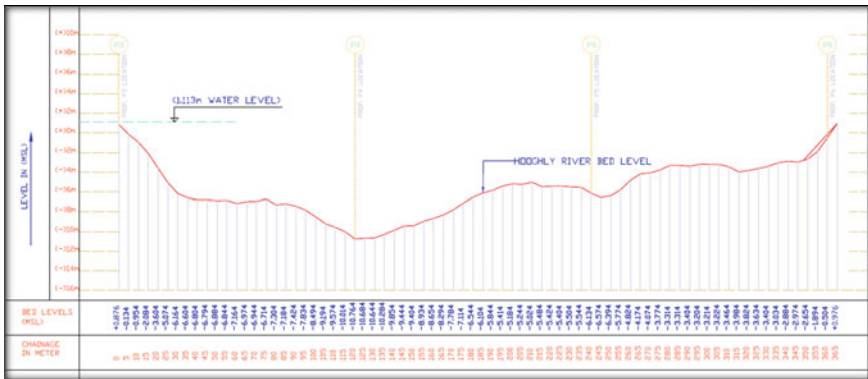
Typical bathymetry of hoogly riverbed with pier locations
